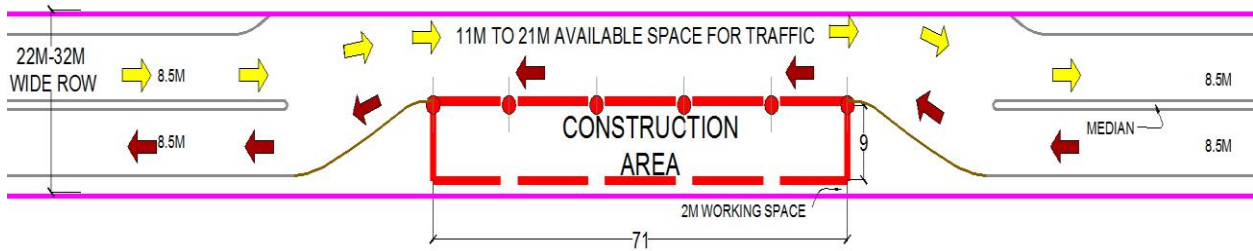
TYPICAL TRAFFIC DIVERSION PLAN (ROW < 32M)
